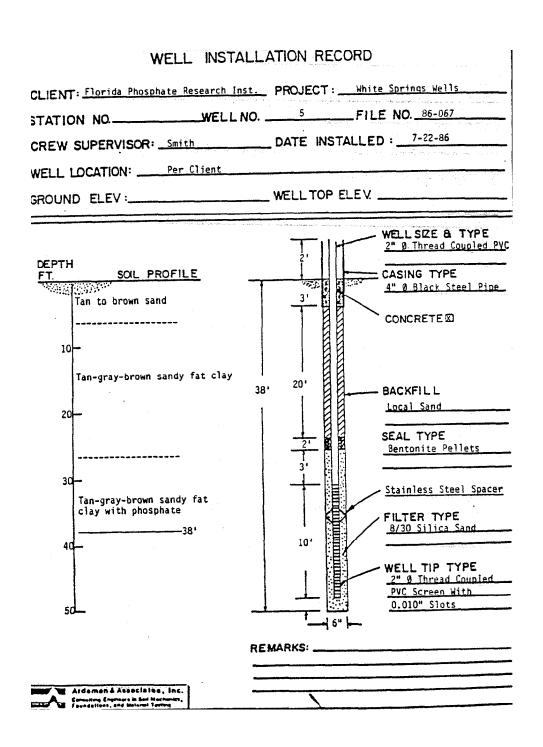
Well Installation Record at Well 5, White Springs Road.
